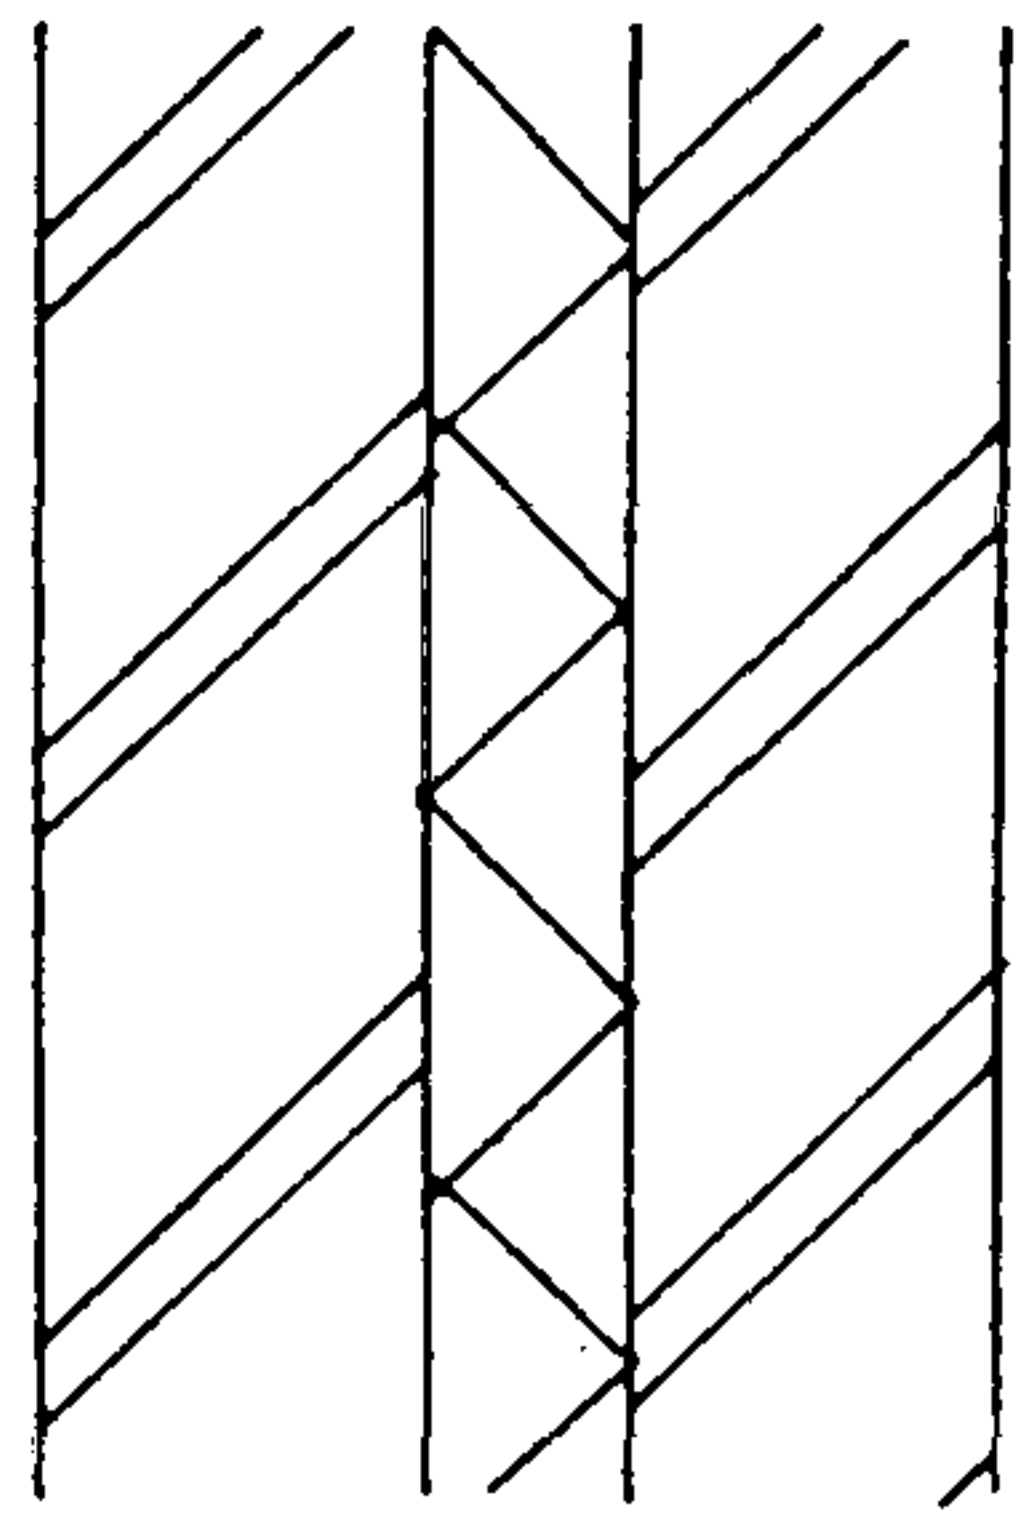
CAVITY BRICK WALL: CAVITY INSULATION
